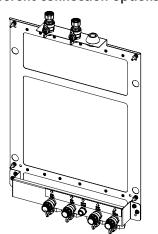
details the connection positions when using the first fix rail or stand-off kits.
